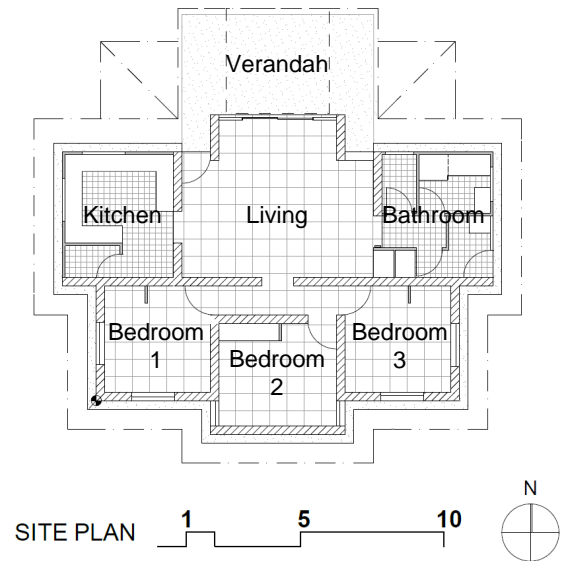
Design of the insulated and uninsulated RE houses showing principal dimensions. Rammed earth walls are denoted by shading whilst unshaded walls are insulated, lightweight steel frame.
